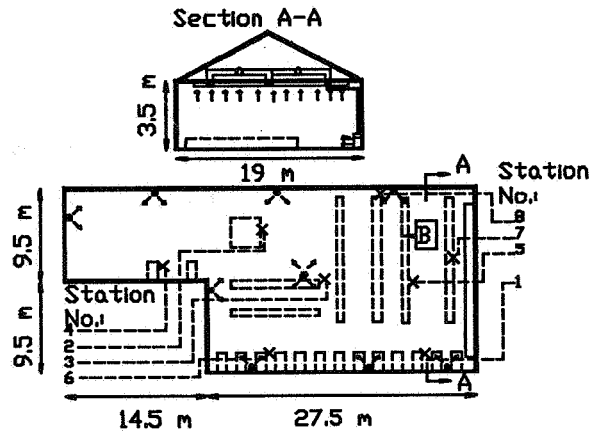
Layout and cross-section of the plant designed for DISPVENT (not to scale)
